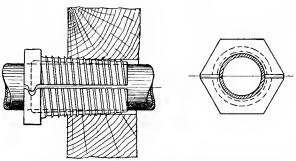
Acme Pipe Clamp for Use in Needle Beam. Western Railway Equipment Company.
